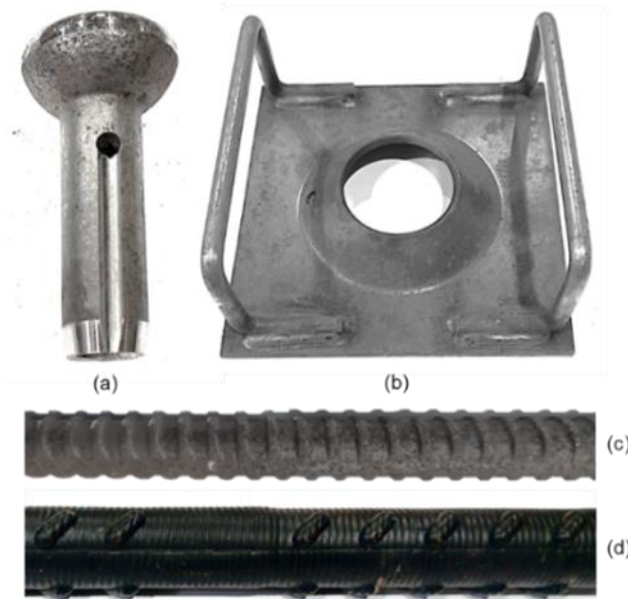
Tunnel reinforcement bolting system (a) spherical grout injection head, (b) dome plate, (c) rebar bolt, and (d) plastic sleeve.
